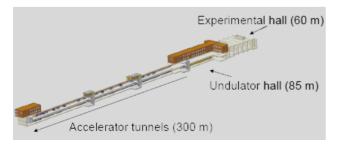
The SPARX surface buildings and the LINAC tunnel design.
